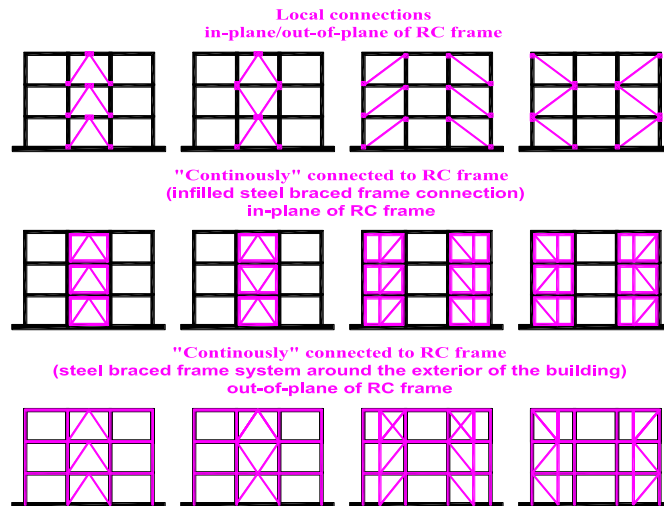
BRBS - RC MRF connections: local connections and continuous connections
